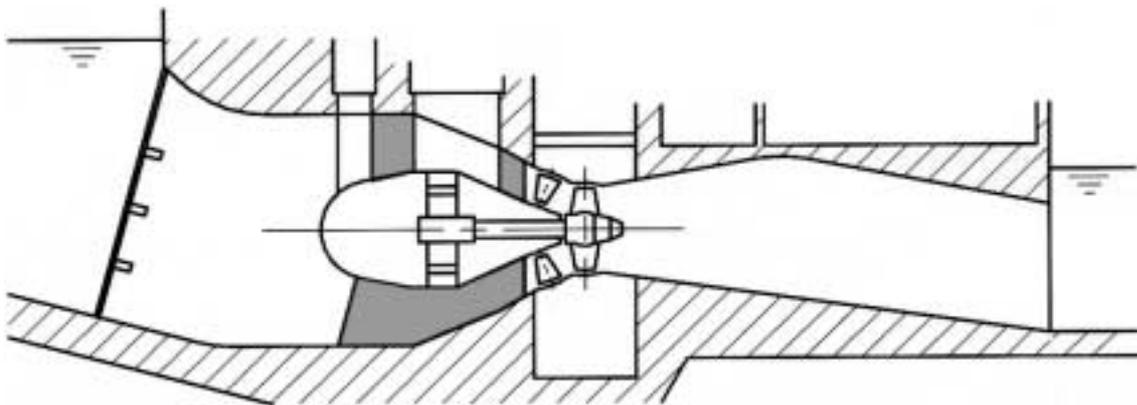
Bulb unit The generator is housed in a bulb in the water passage. The unit may be directly driven or equipped with a gear box.
